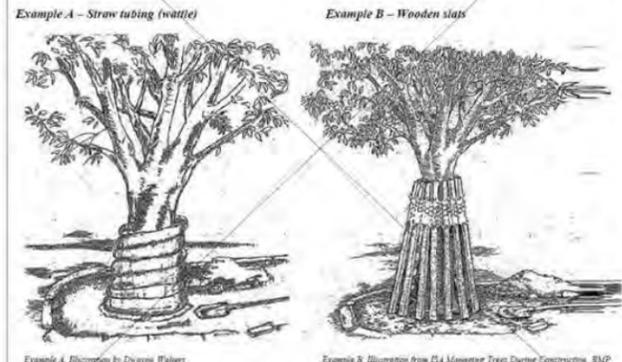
TREE TRUNK PROTECTION EXAMPLES (via City of Berkeley)
